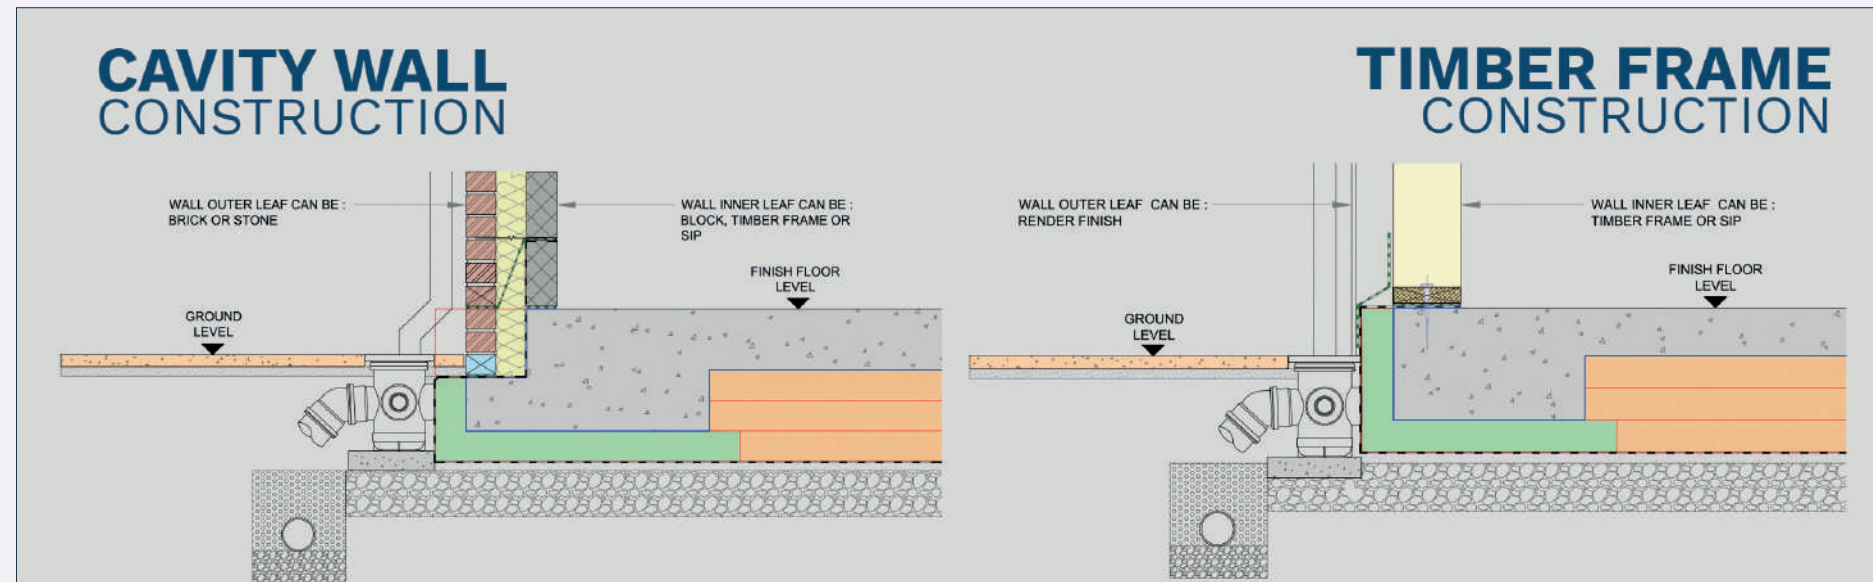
Future Found trenchless system (Source: Build-Lite (UK) Ltd)
